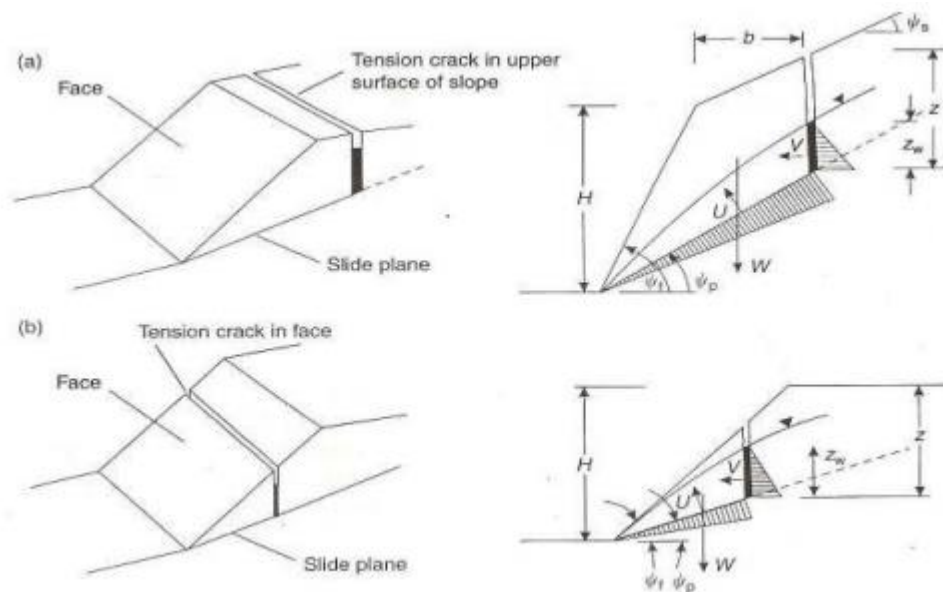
plane slope failure: (a) tension crack in the upper slope; (b) tension crack in the face
